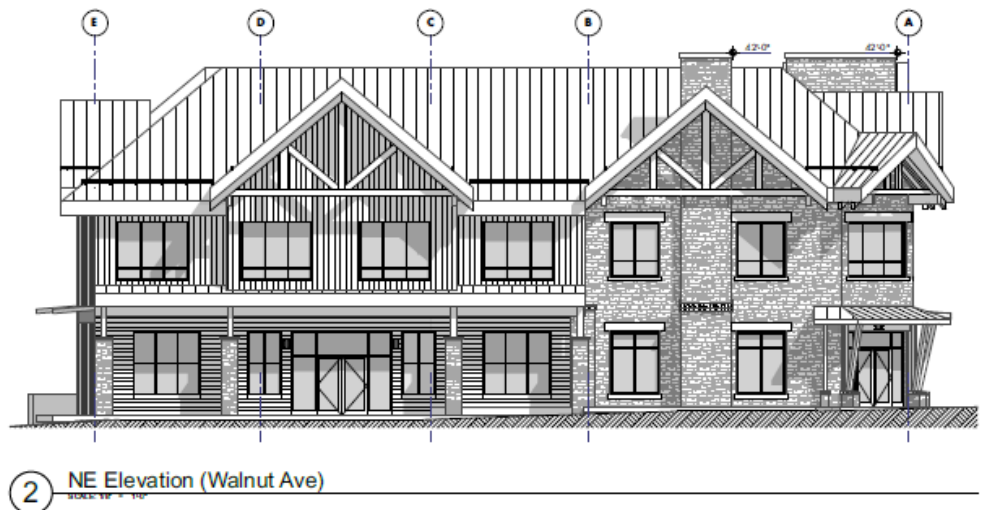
Project Plans, NE Elevation (Walnut Ave), Sheet A-201
